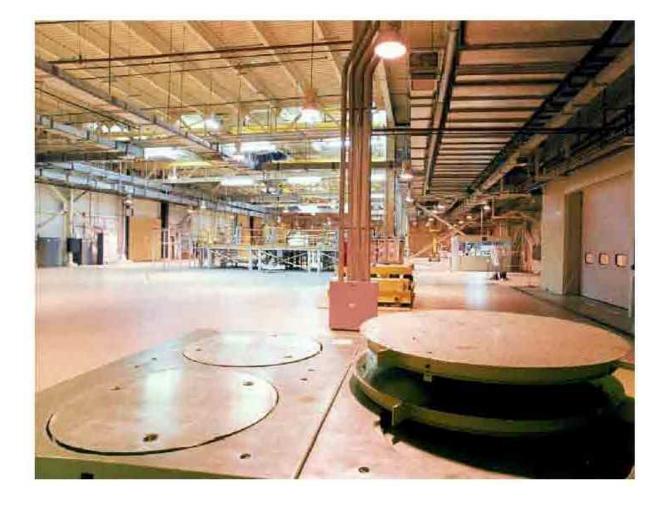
Westward View of CH Bay of the Waste Handling Building
